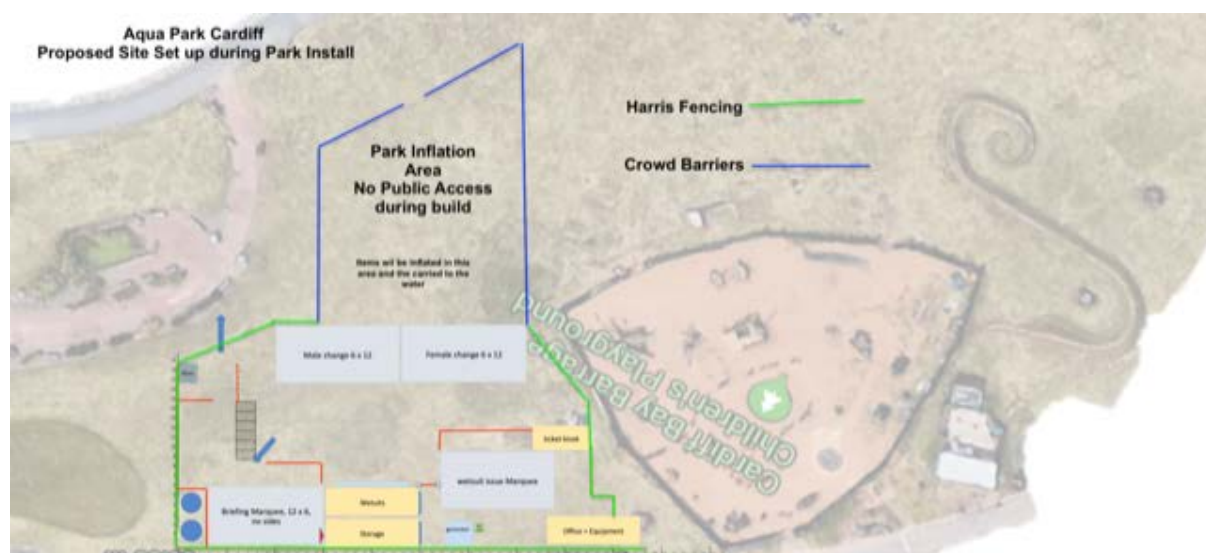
Proposed Onshore Site Set Up during Water Park Installation.
